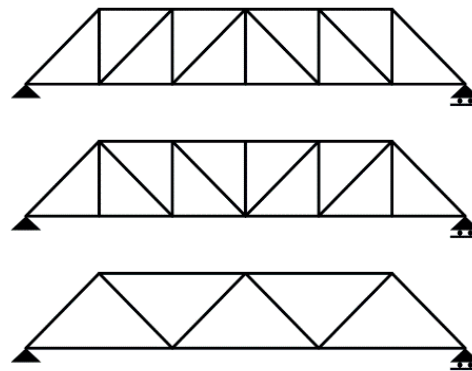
Howe truss (top), Pratt truss (middle), Warren truss (bottom)
